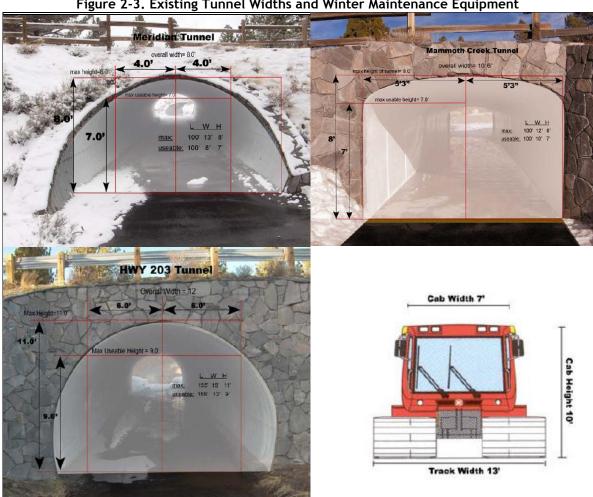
Existing Tunnel Widths and Winter Maintenance Equipment
